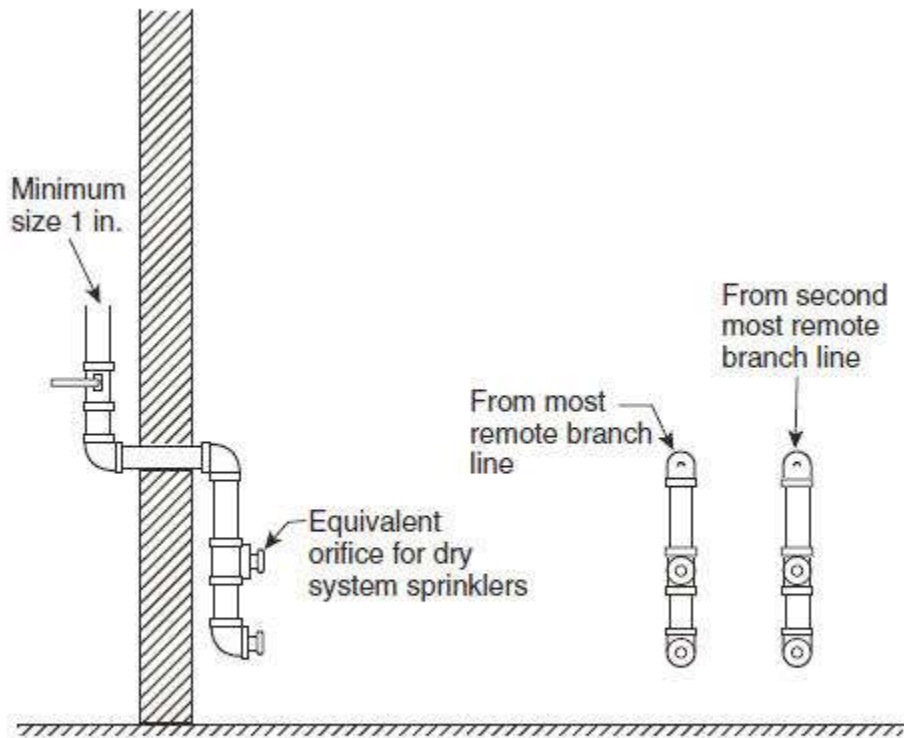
Example Manifold Arrangement (Four Sprinklers).
